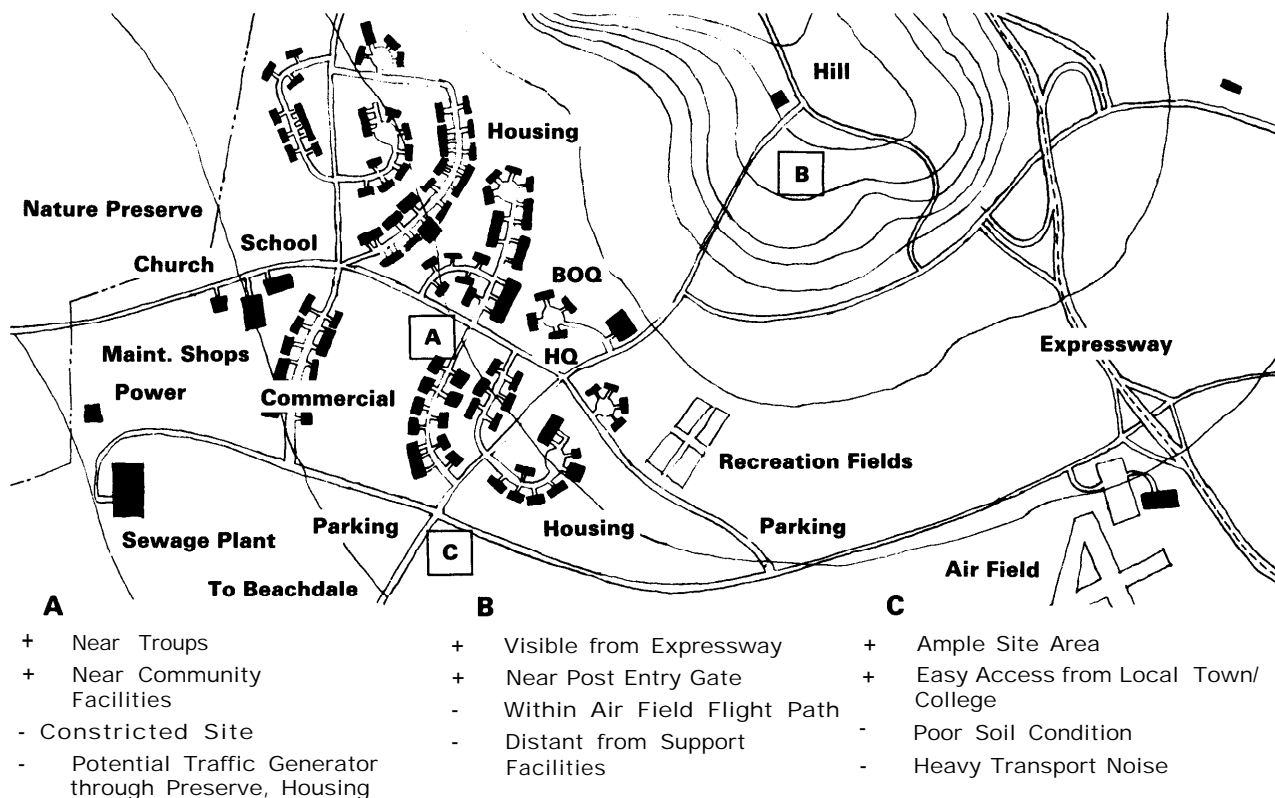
LOCATION CONSIDERATIONS-INSTALLATION MASTER PLAN
